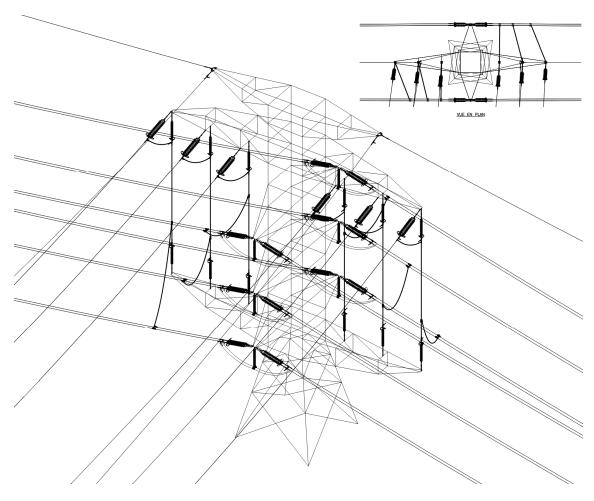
EPZ CONFIGURATION 1 3D and PLAN VIEWS
